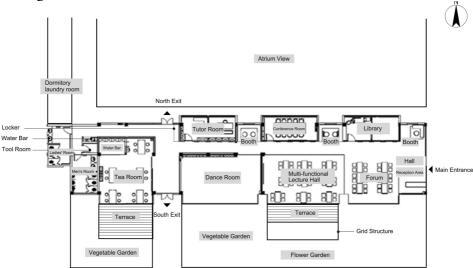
Layout plan of Bingwen Academy of Southeast University (modified from [5]).
